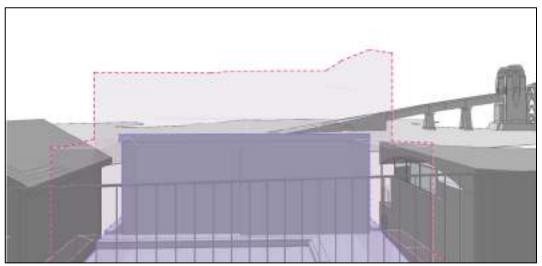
Photomontage of existing view from balcony of No. 3/17 Waiwera Street Source: Collins & Turner Architects
